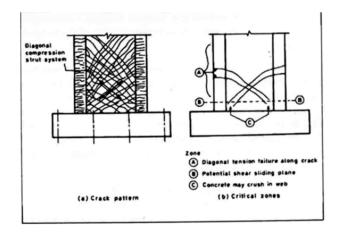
The critical zone and crack pattern of the shear wall (Source: The Indian concrete journal)
